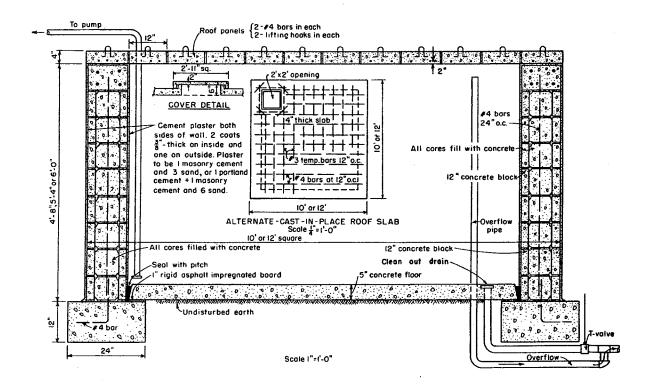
Cross section of a concrete block-walled below-ground cistern, showing important features. (Source: PSU Ag. Ext. Service, Order #800-86 Concrete Masonry Cisterns)
